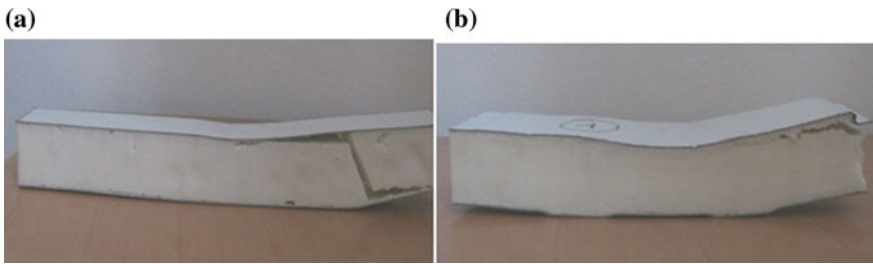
Failure modes of sandwich panels, a Shear failure of the core; b debonding skin/core
